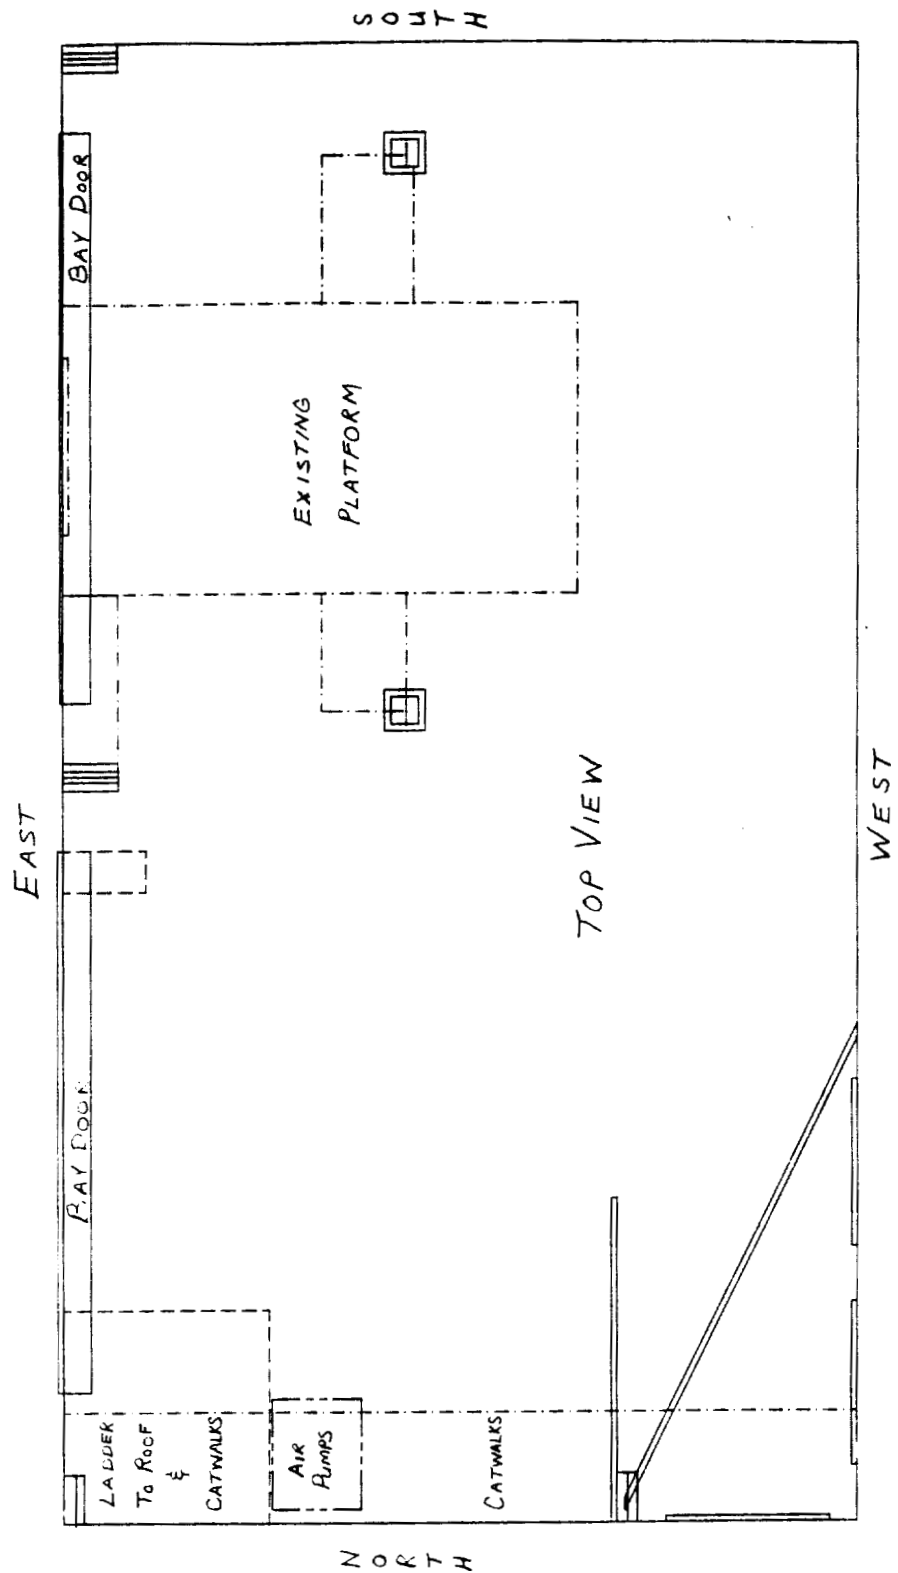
Existing Facility Floor Plan with Unused Air-Handling Units Removed
